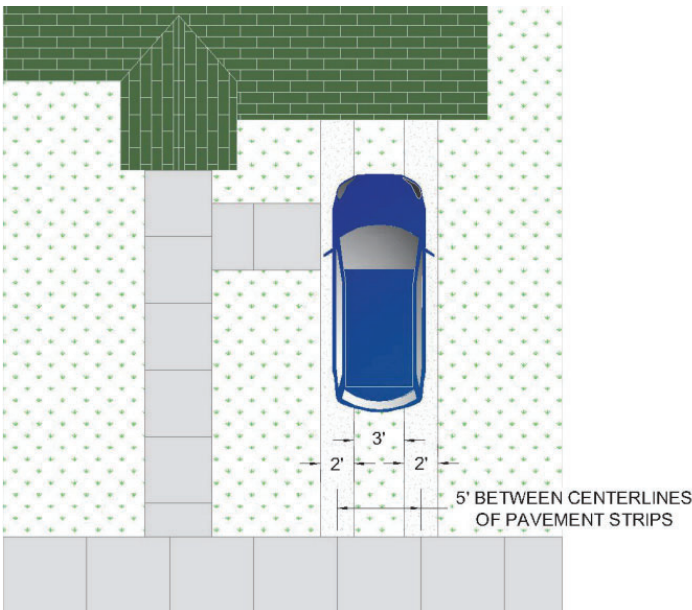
Example of a ribbon driveway with 5’ between the centerline of the paving strips.
